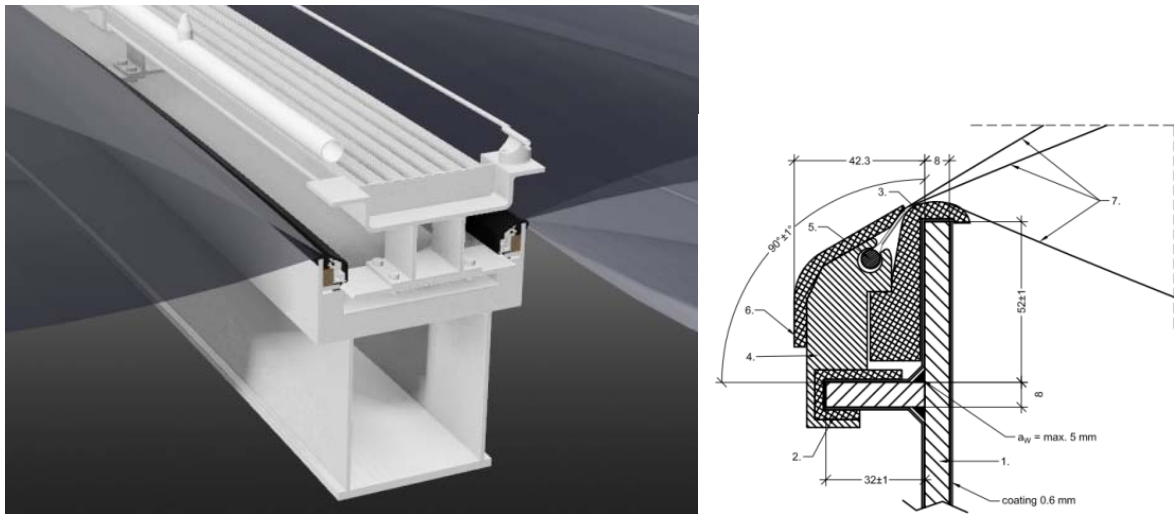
“Beach Club” foil dome, gutter cross-section with thermal insulation; 3D computer image and detail drawing, draft design, seele cover
